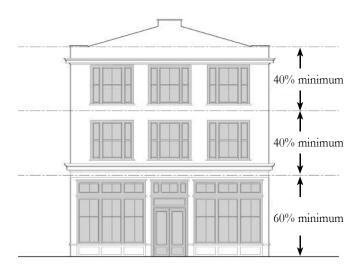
Façade transparency requirements for buildings with shopfront.
